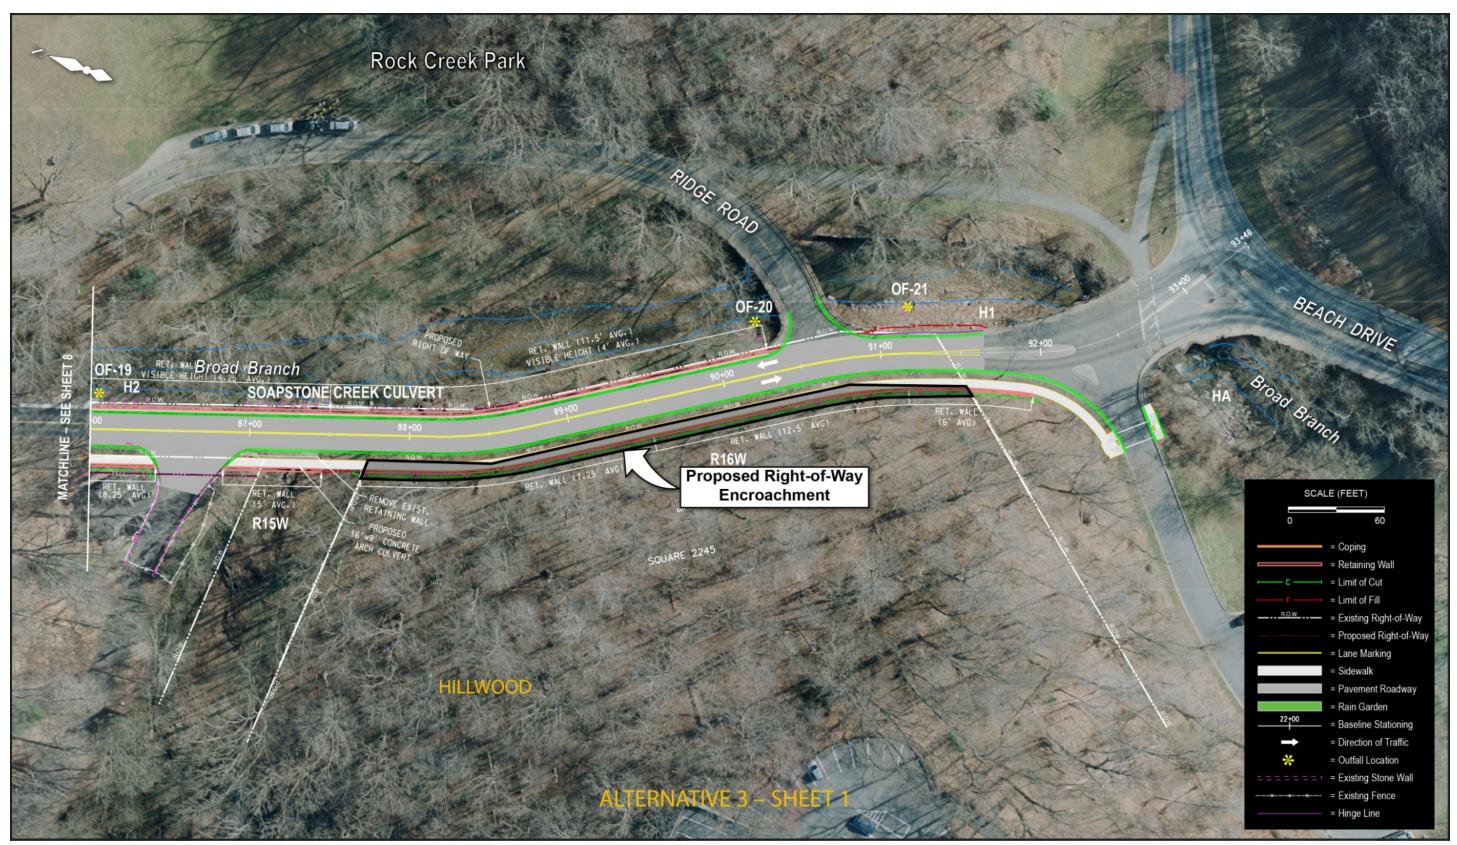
Roadway Features and Proposed Right-of-Way Encroachment - Alternative 3
